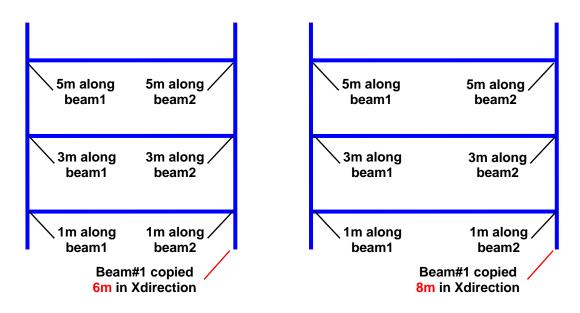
Parametric definition of beam locations before (left) and after (right) a change.
